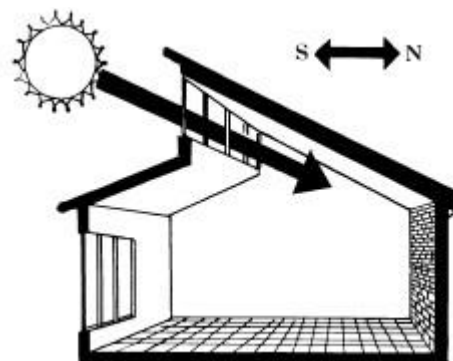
Clerestory windows in a direct gain system let sunlight strike thermal mass on the back wall.
